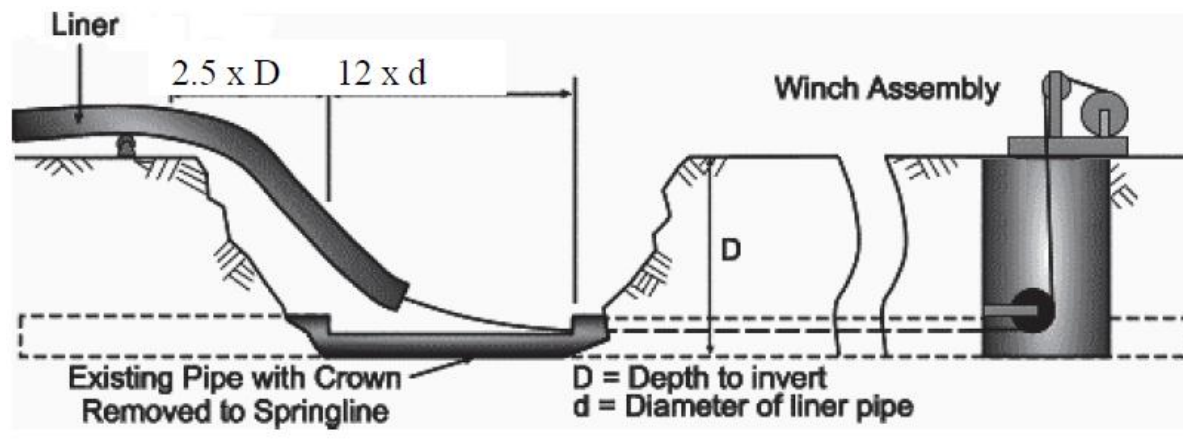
General Site Layout for Sliplining (Source: Plastic Pipe Institute)
